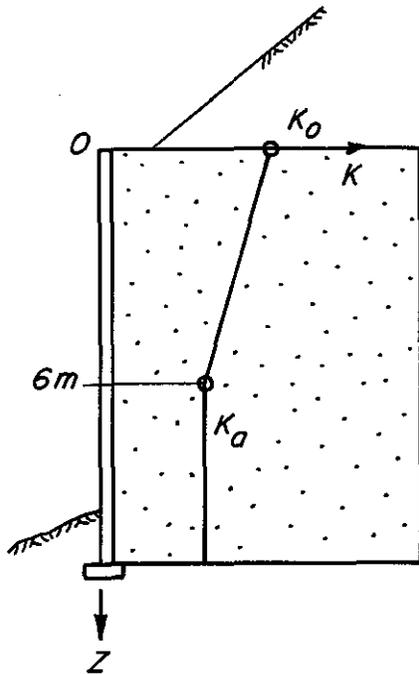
Earth pressure distribution in a reinforced earth structure
